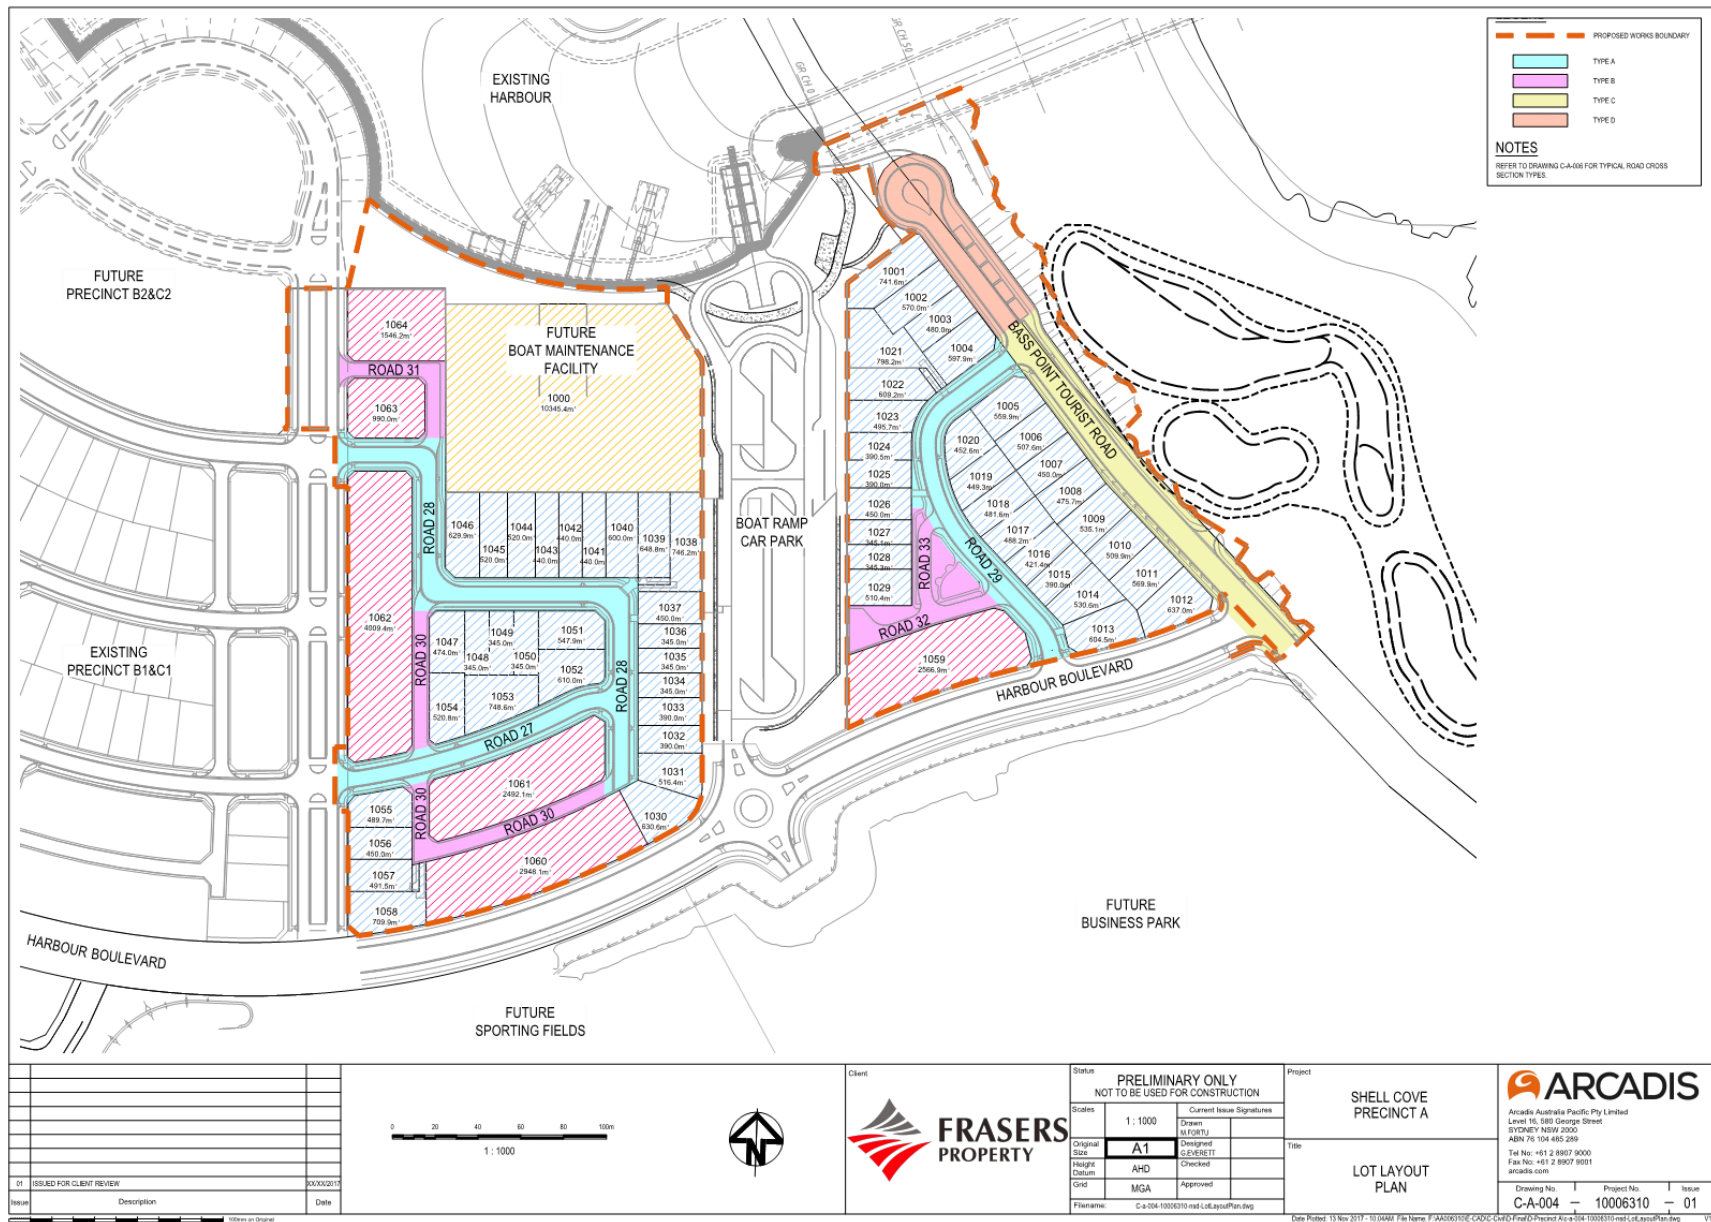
Precinct A Road Hierarchy and Lot Layout
